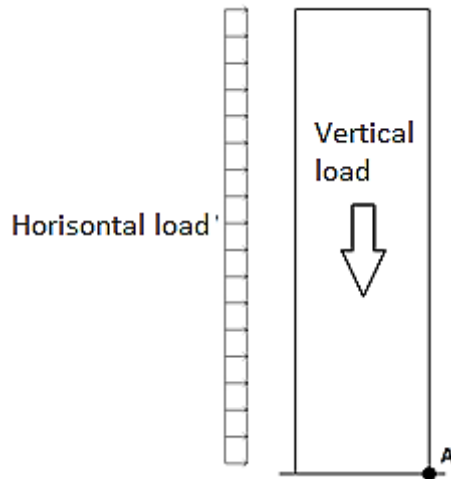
The stability against overturning of a building. The moment that arises at point A due to horizontal load w must be smaller than the moment at A due to vertical load.
